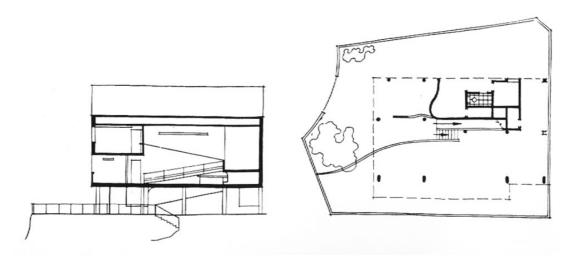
Lagoa House, Rio de Janeiro, 1942, Section and Floor Plan
